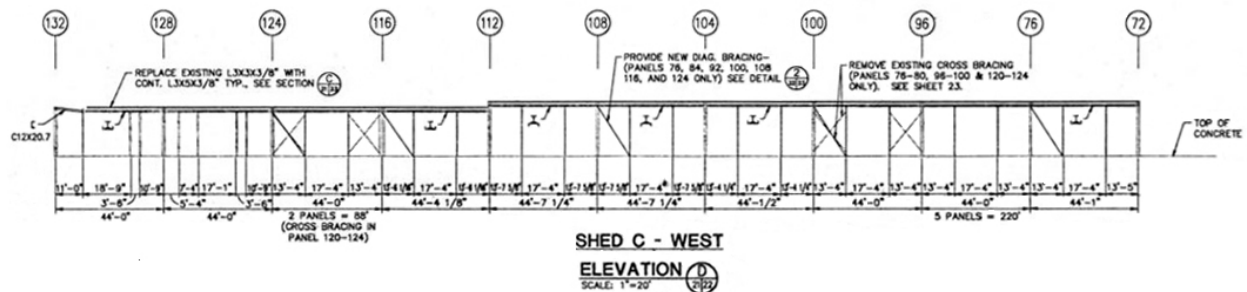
Shed C spans and retrofit installed in the west direction.
